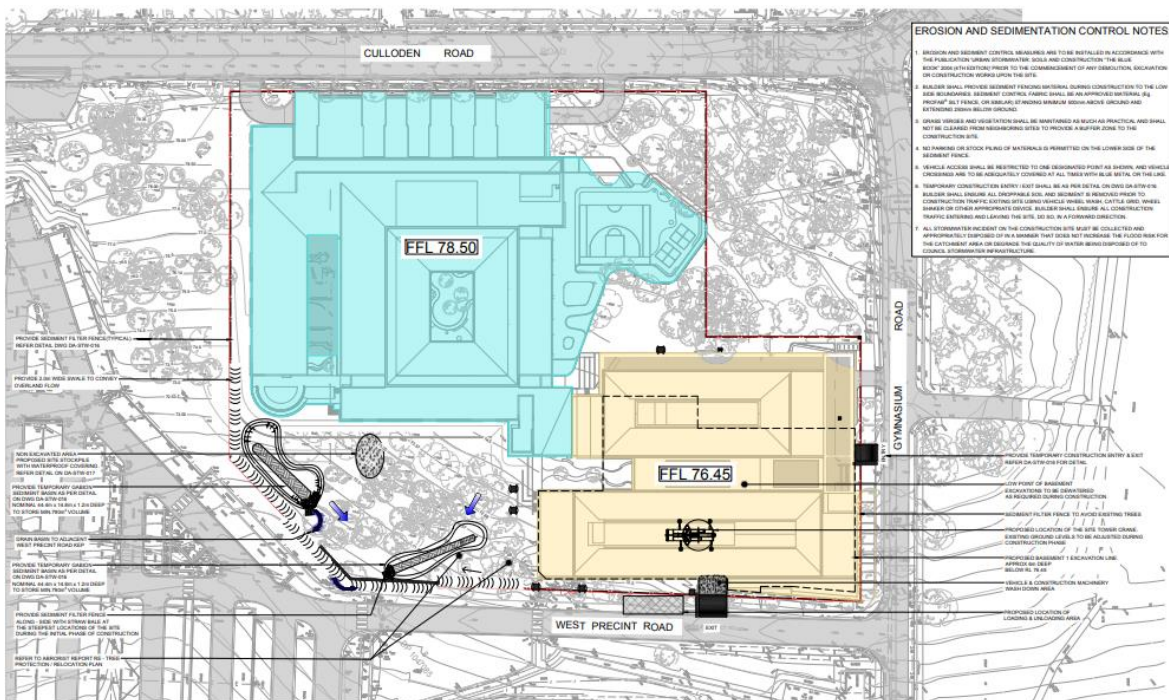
Sediment and Erosion Control Plan (LP Consulting)
